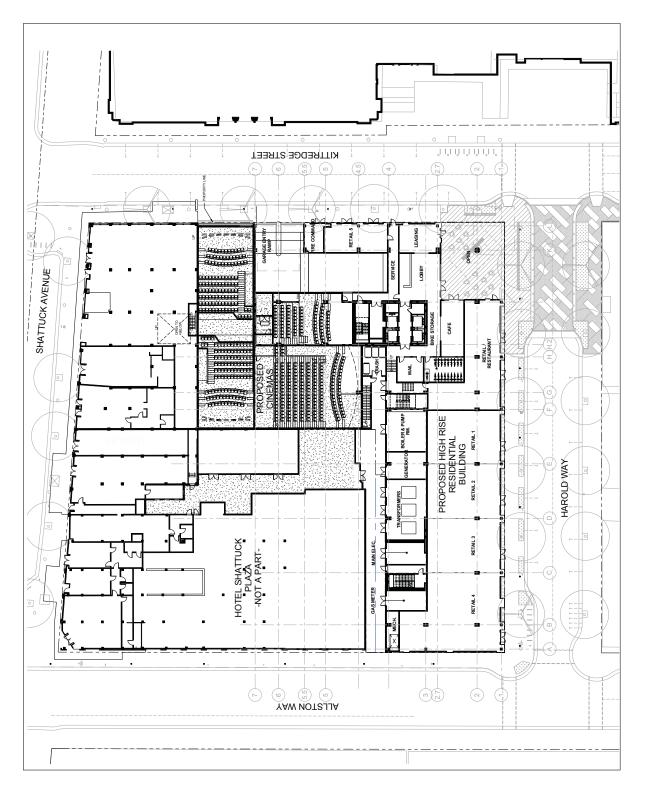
PROJECT SITE PLAN AND DRIVEWAY LOCATION
